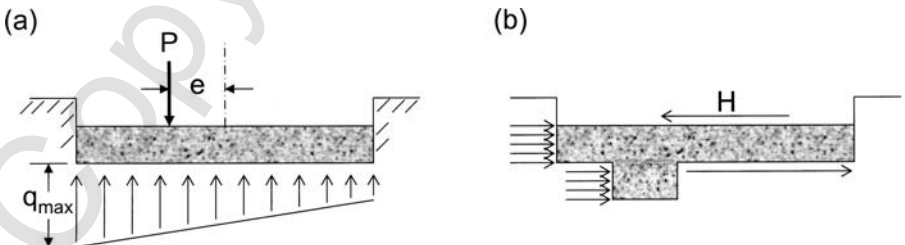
Elevation views of shallow foundations. (a) Bearing stress for a foundation under eccentric vertical loading. (b) Stress distribution for a shallow foundation under horizontal loading.
